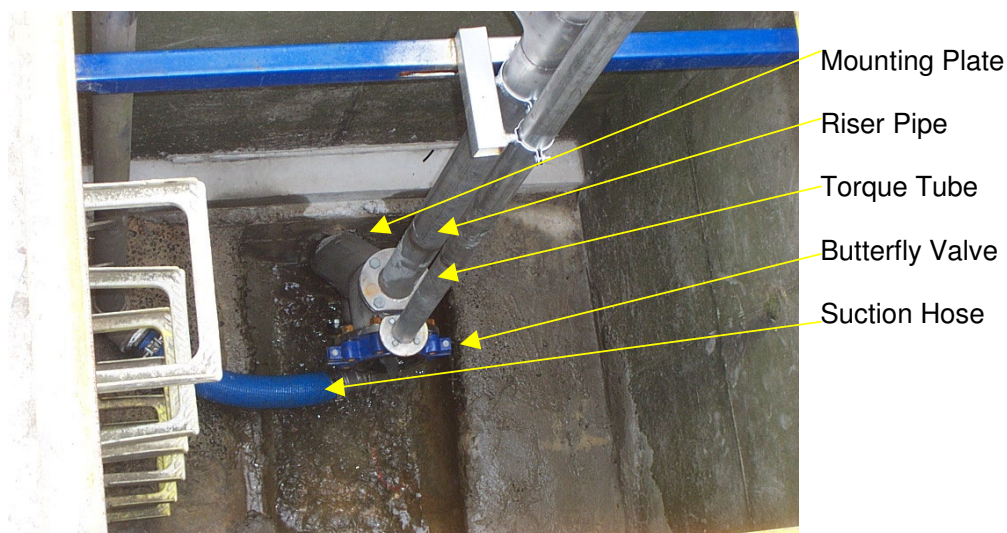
Valve mounting plate, standpipe and torque tube assembly
